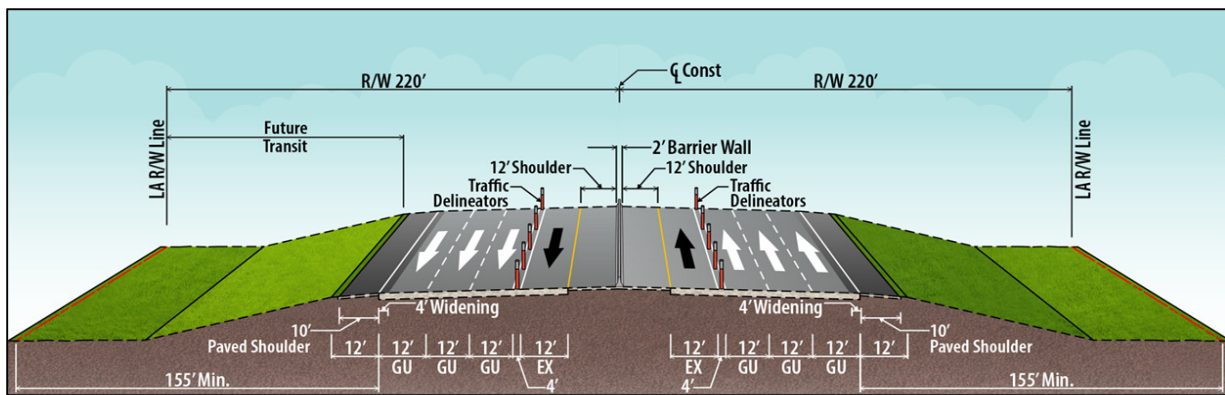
I-275 Mainline Starter Project Build Alternative Typical Section from south of 9th Street North to north of 4th Street North (Segment C-SP3)
